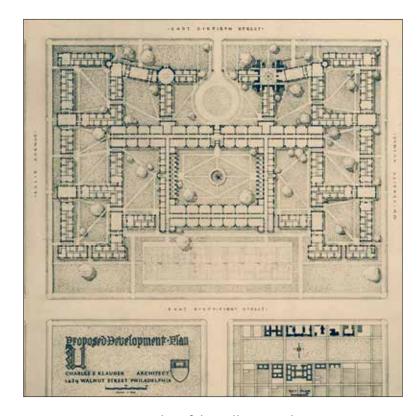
Site Plan of the College, South Campus, Charles Z. Klauder, Architect, circa 1927
